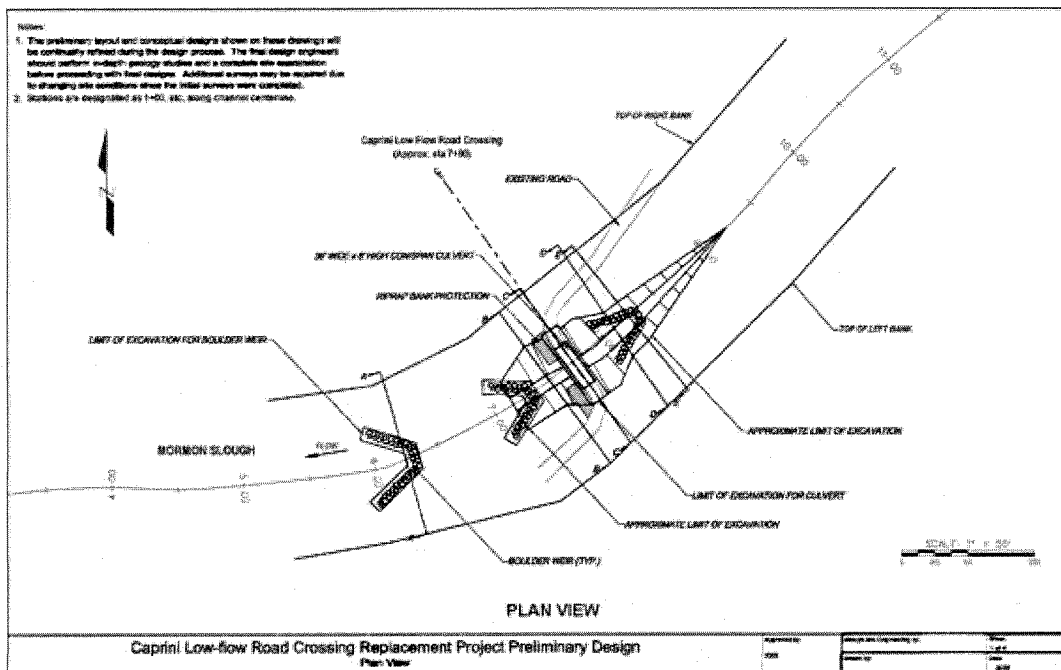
Preliminary design drawing: plan view for Caprini Low Flow Road Crossing Structure Replacement Project. Source: CDWR 2007. Subject to revision.
